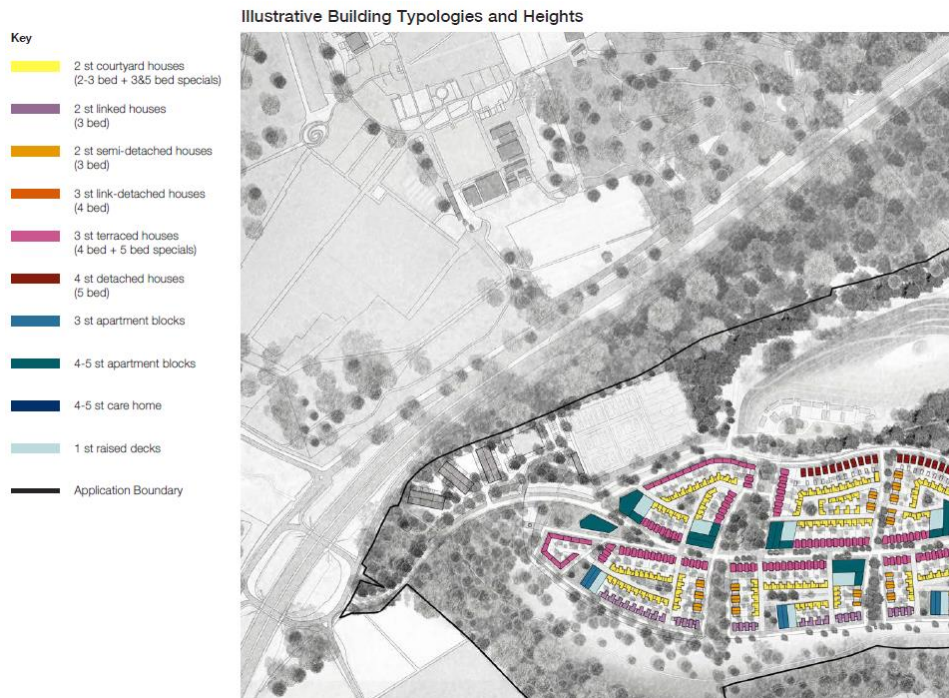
Extract from buildings plan for 15/P/00012 showing building heights- western end
